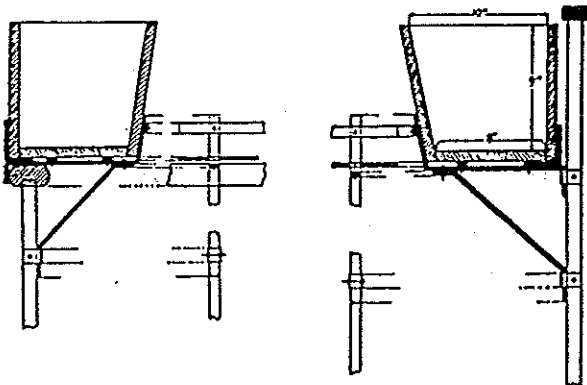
Left. Fastening a window box to the top of a balcony railing. Right. Fastening box in front of a balcony railing, the top of the box slightly below the top of the railing.
